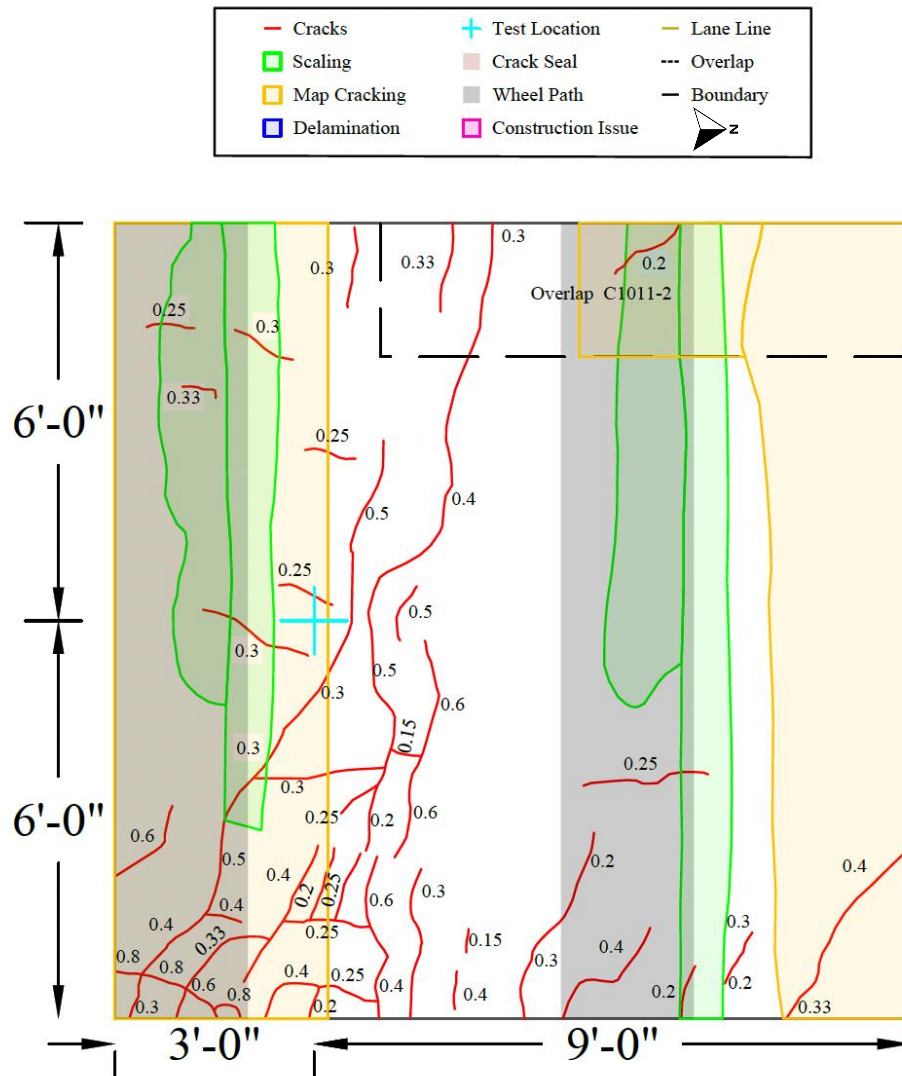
Test location 1 of lightweight concrete deck at bridge C-1011.
